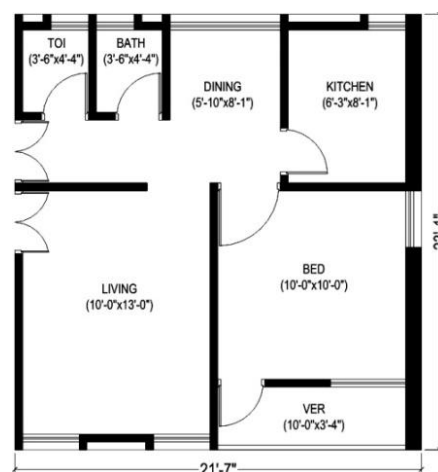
Floor plan of a unit at Azimpur Government Housing (Rasid, M., 2000)
